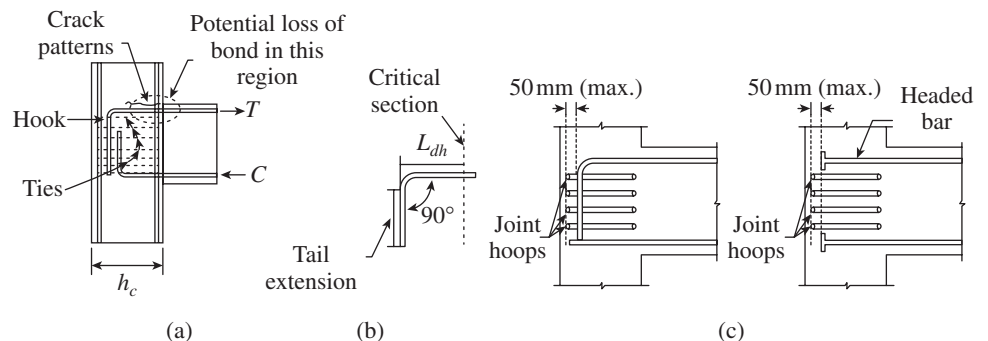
Anchoring of beam bars in exterior joints (a) Anchorage details (b) Hook details (c) Location of hoops and headed bars (Reprinted with permission from ACI)
